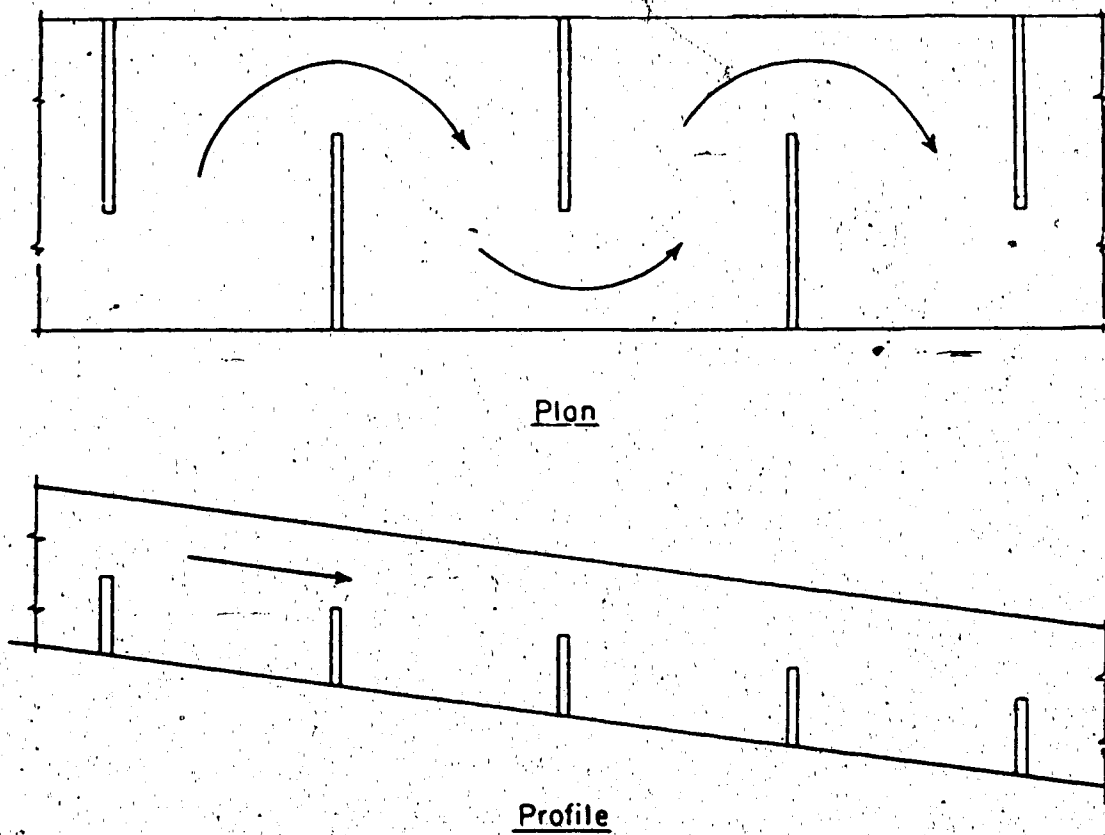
Alternate low barrier culvert baffles. (adapted from Watts, 1974)
